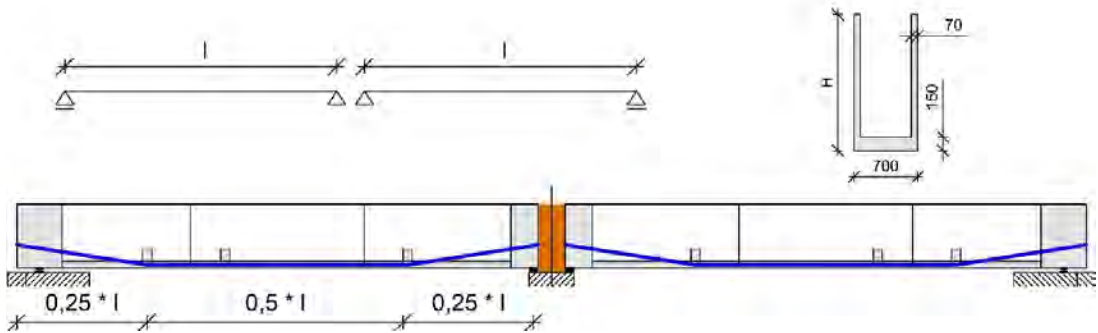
Static system, cross-section and post-tensioning of construction phase 1
